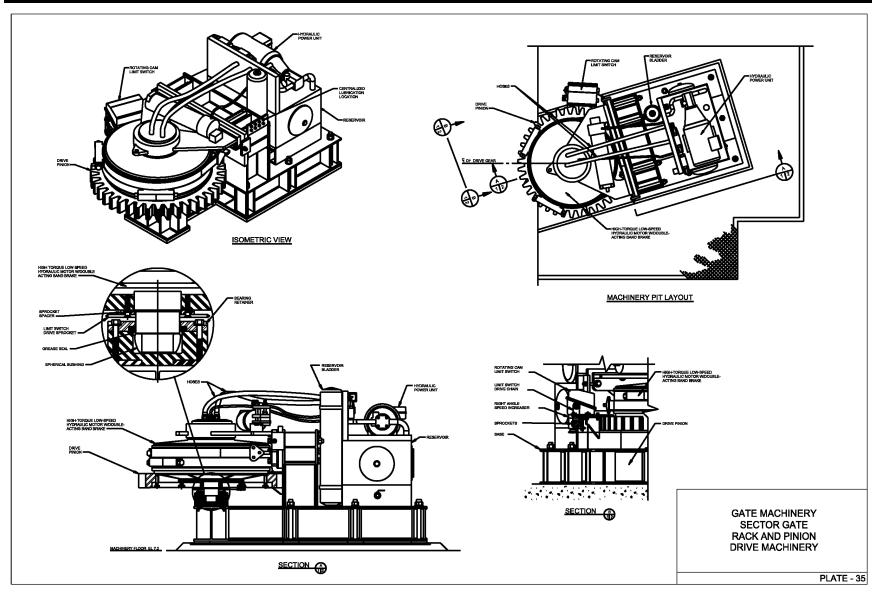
Plate 35: Gate machinery, sector gate, rack, and pinion drive machinery
